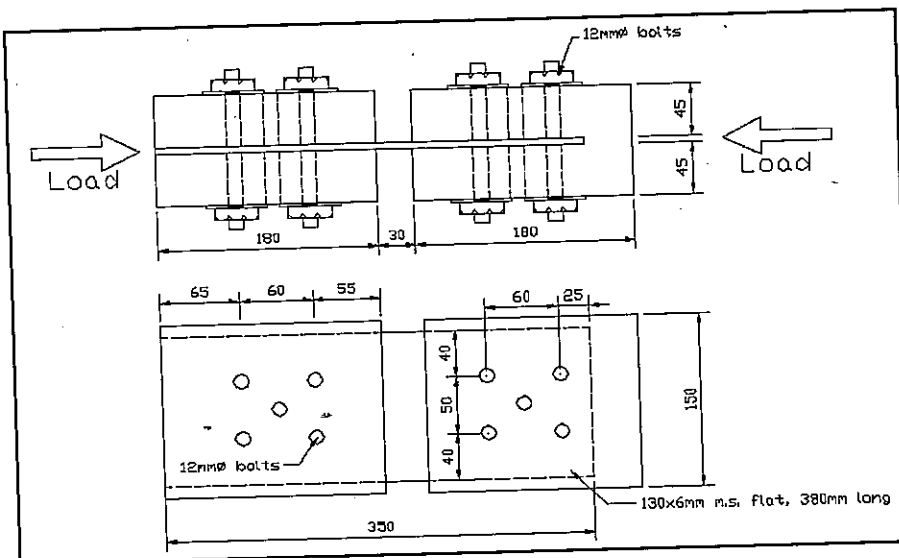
Arrangement of bolted connections for W-S-W bolted joints
